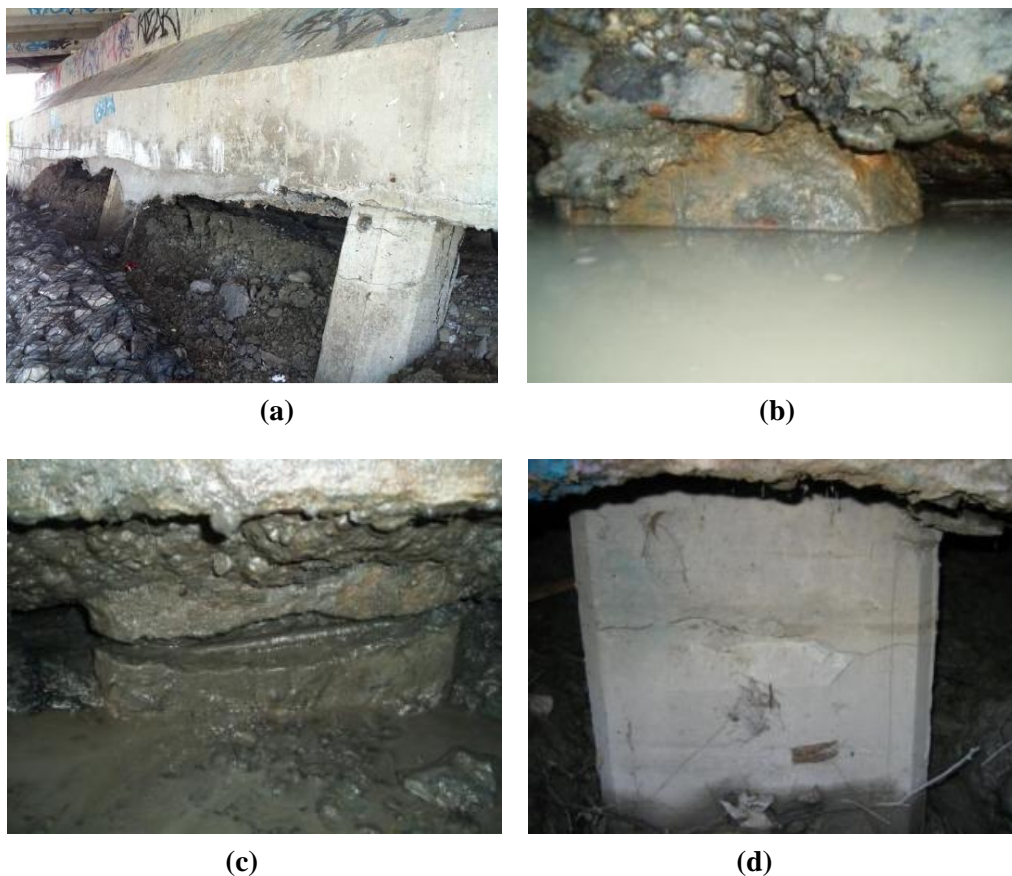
Damage to pile foundations: a) Plastic hinging in abutment piles of Bridge Street Bridge [Photo by L. Wotherspoon]; b) Exposed piles during the securing works on Avondale Road Bridge [Courtesy of OPUS]; c) Exposed piles during the securing works on Gayhurst Road Bridge [Courtesy of OPUS]; d) Flexural cracks on Fitzgerald Ave Bridge piles [Courtesy of OPUS]
